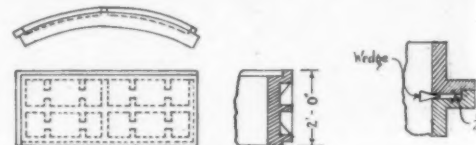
Sections of English type of tubing have external flanges and lock without bolts or gaskets.
